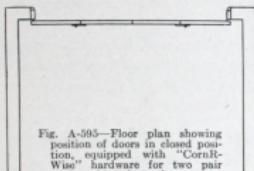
Floor plan showing position of doors in closed position, equipped with "CornR-Wise" hardware for two pair of doors hinged together.
